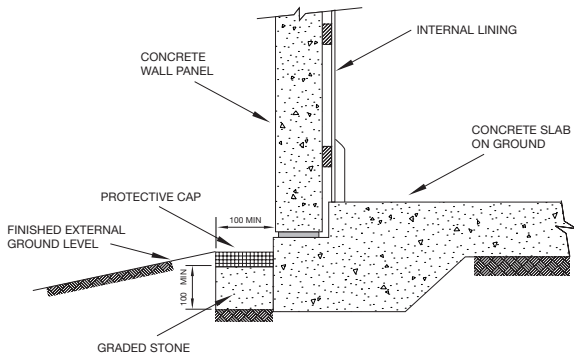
Typical Detail for Graded Stone External Perimeter Barrier at Slab-On-Ground
